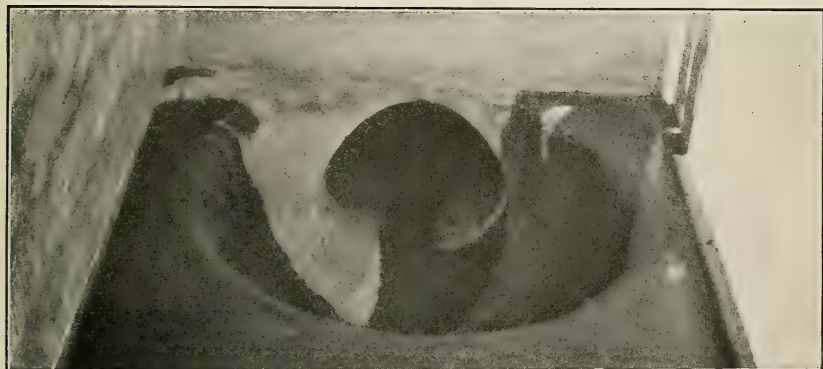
SIPHON INLET MADE FROM FORM SHOWN IN FIGURES 1 AND 2. ENTRANCE WELL SUBMERGED, PREVENTING AIR BEING CARRIED INTO PIPE.
